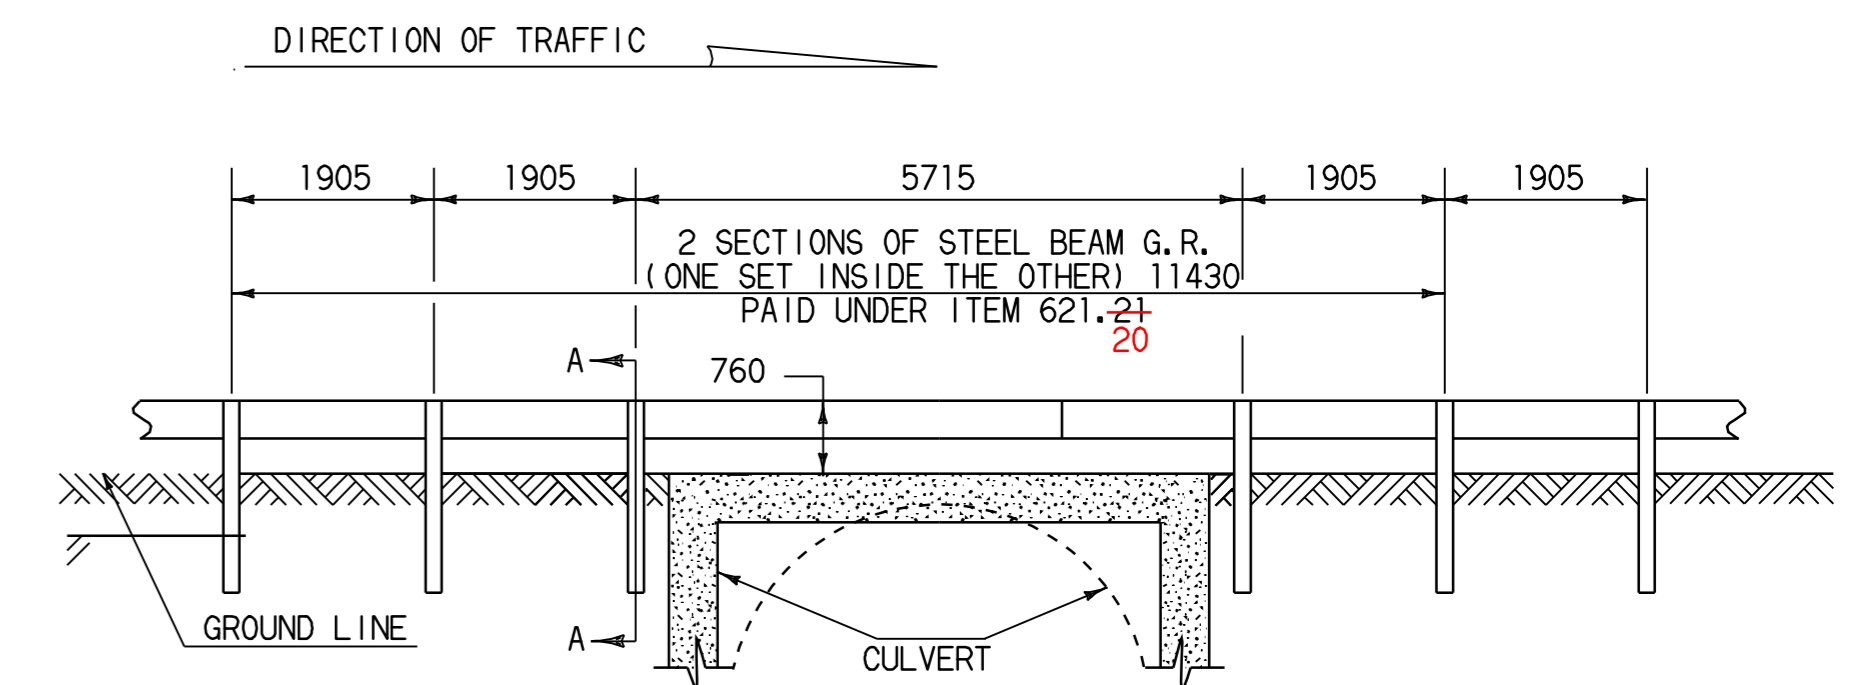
DETAIL OF STEEL BEAM GUARDRAIL AT BRIDGE #6 @ STA 8+076, HARTFORD (MM 5.018)
